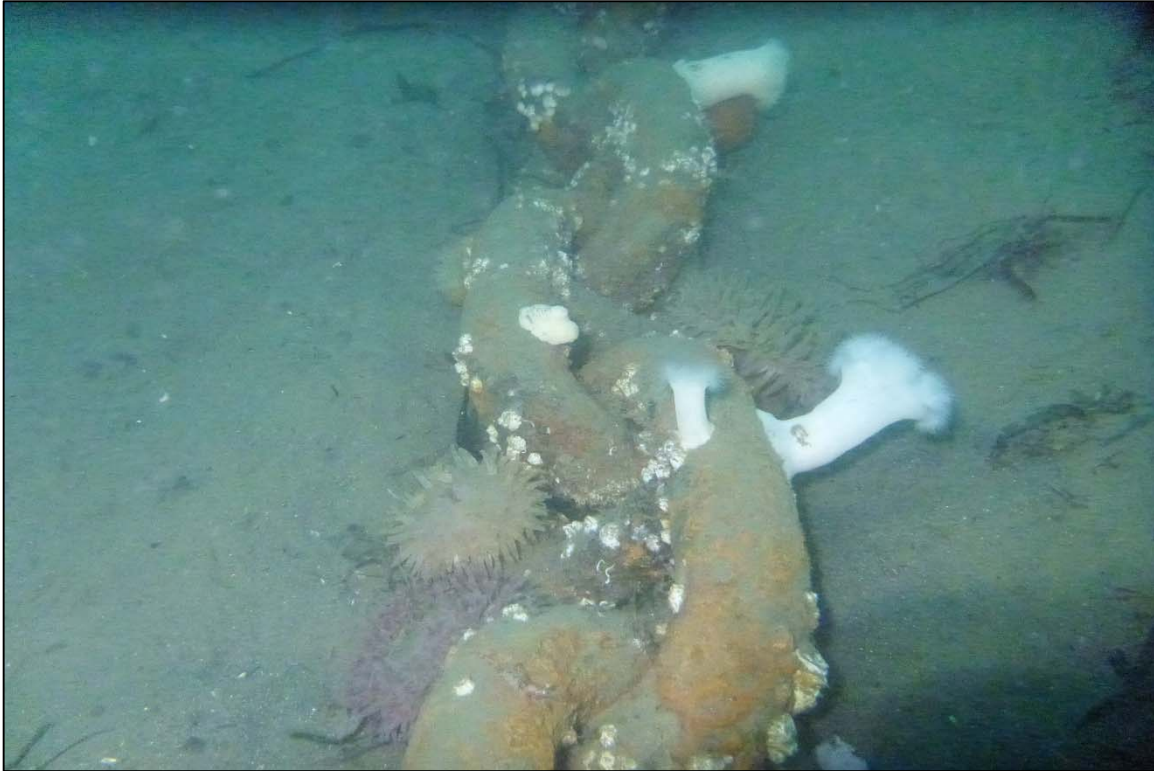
View of the Lower Anchor Chain on the Channel Bottom at Site 1 Anchor Line 2, Looking West.
